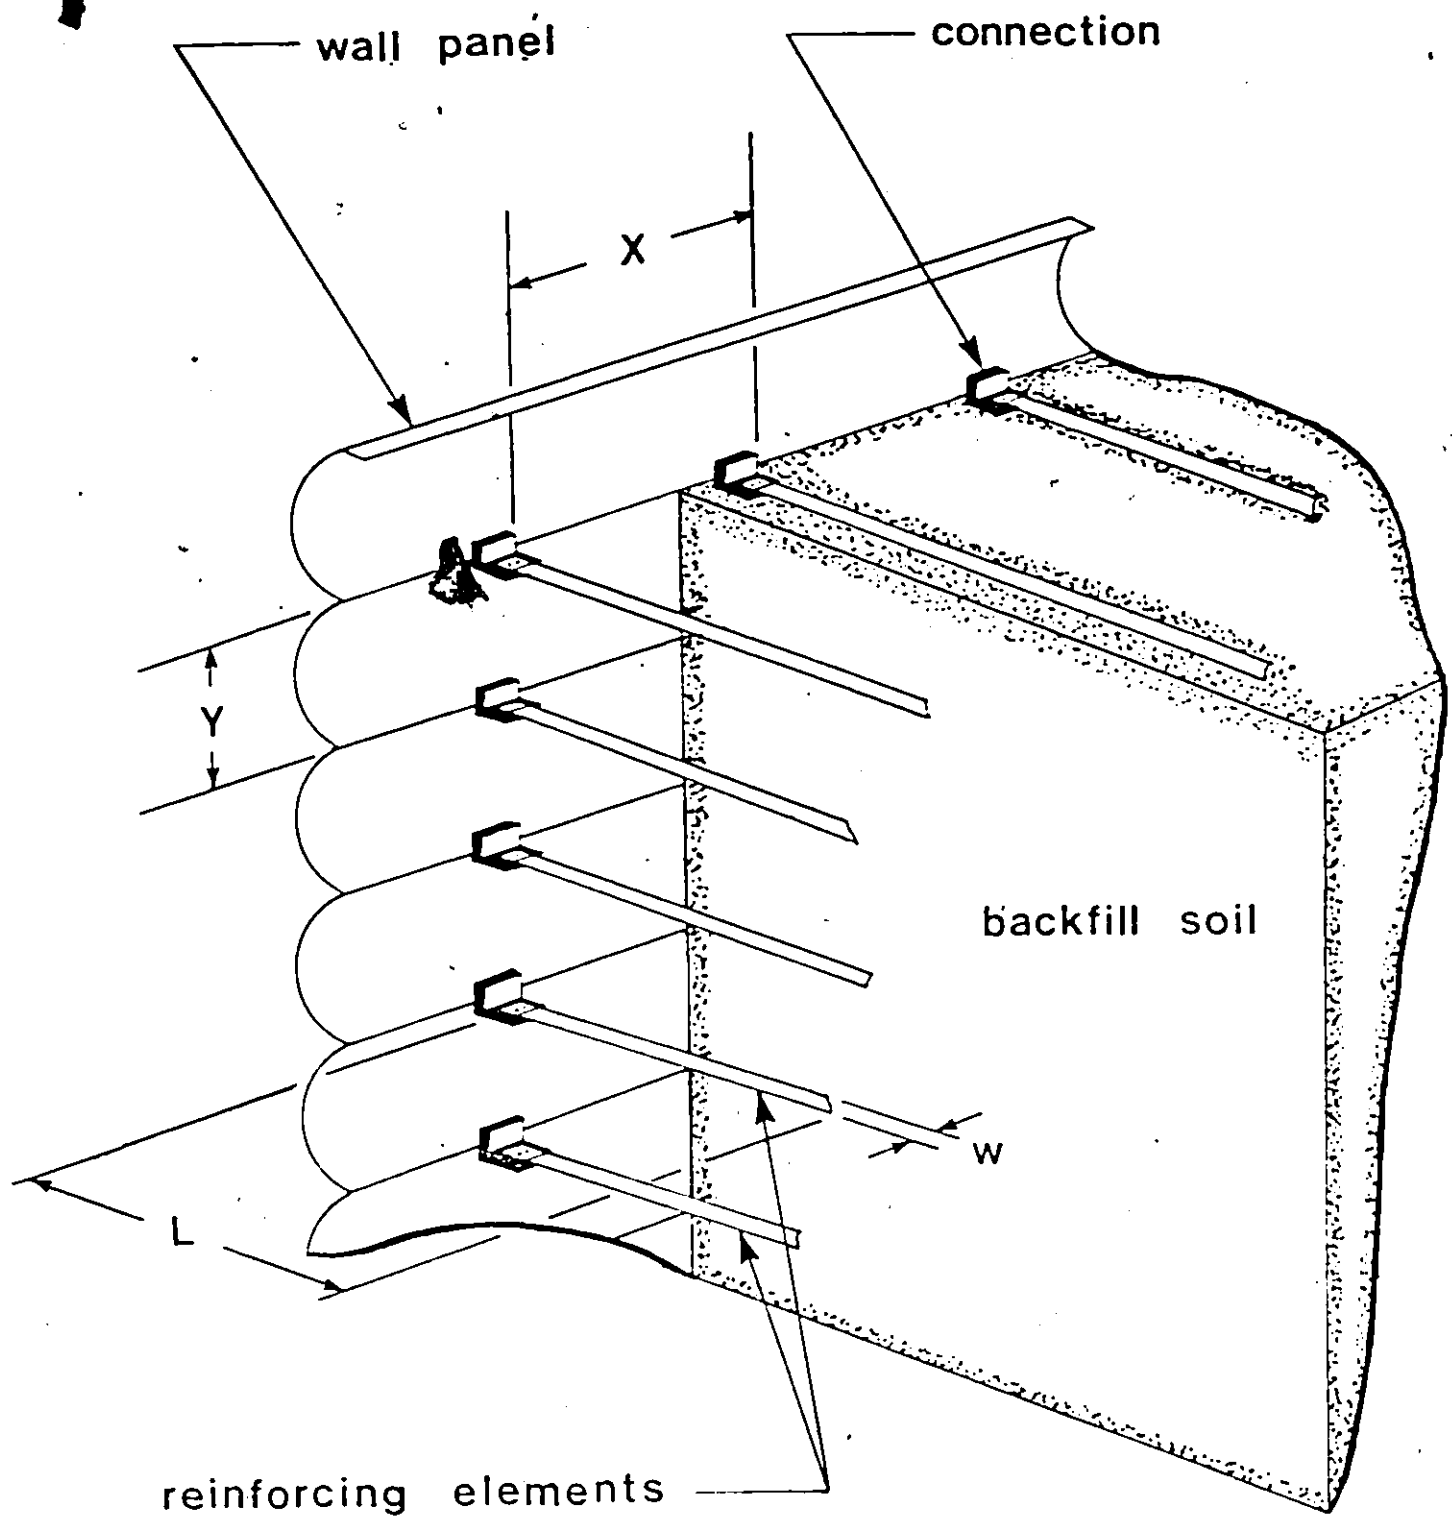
SCHEMATIC VIEW OF A REINFORCED EARTH WALL
